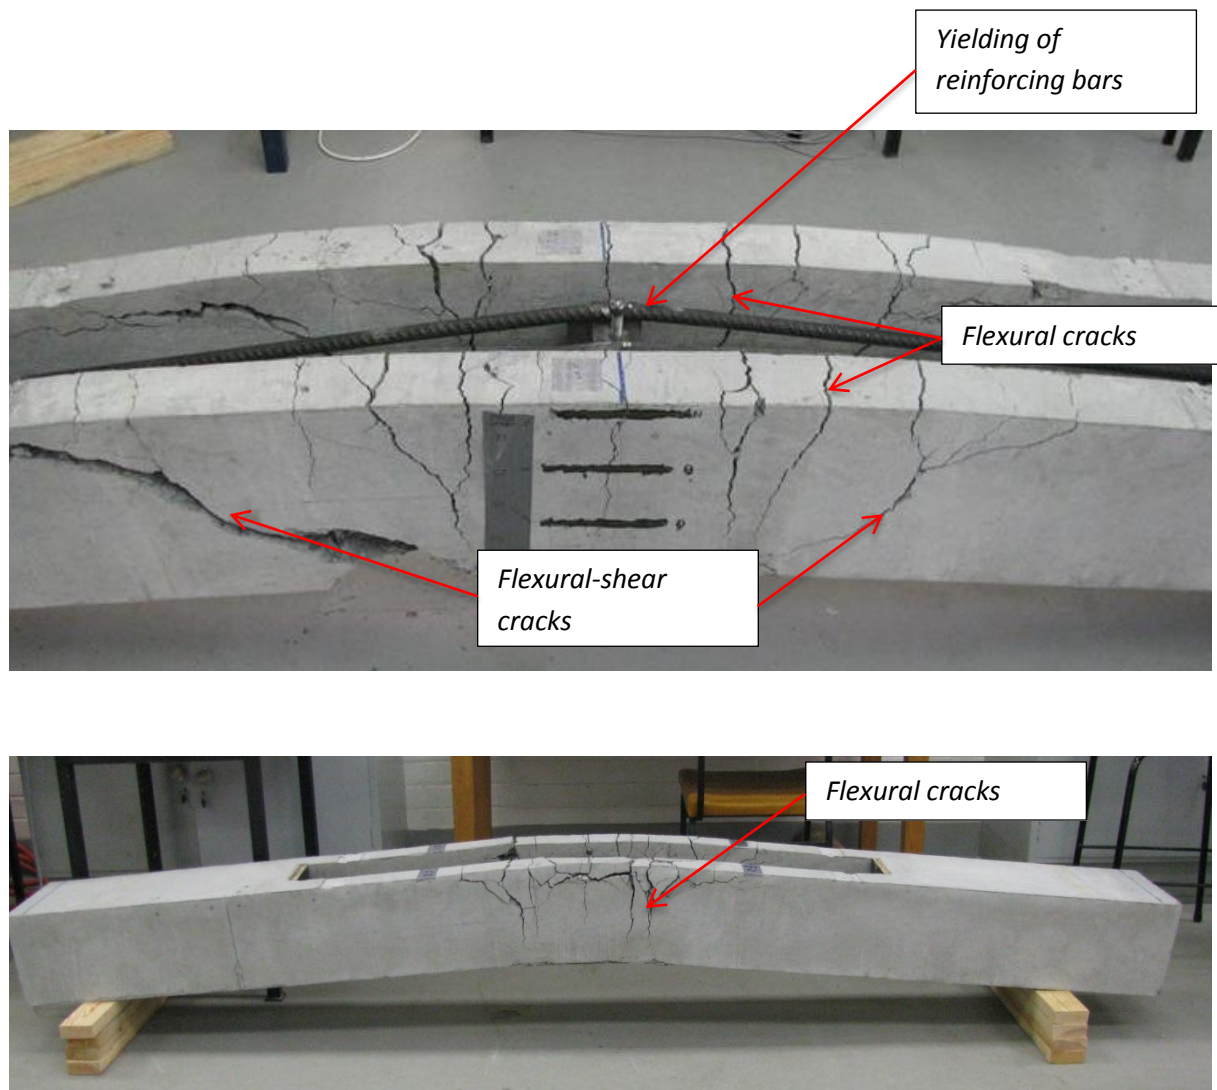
Typical failure of Beam 1 (top) and Beam 2 (bottom).
